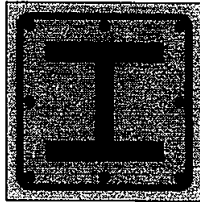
Cross section of a column with encased H-steel profile reinforced with longitudinal steel bars.
